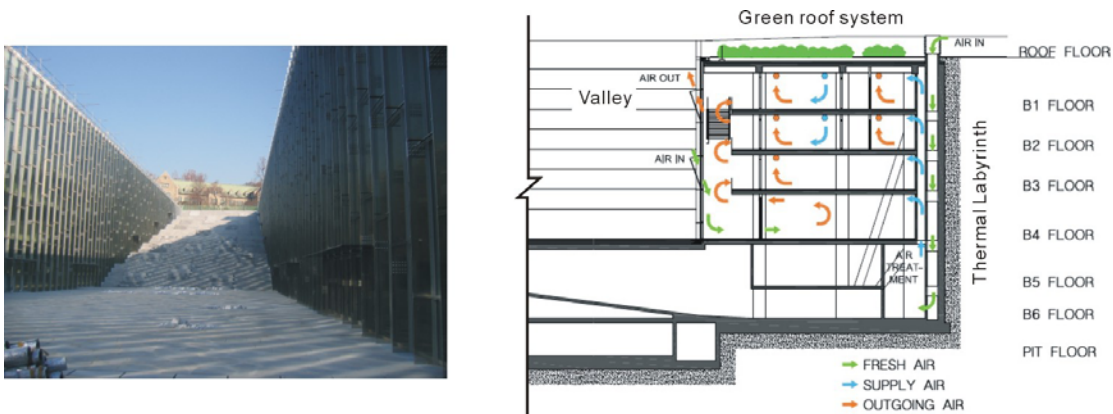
Outdoor air inlet windows for natural ventilation and green roof system of ECC
